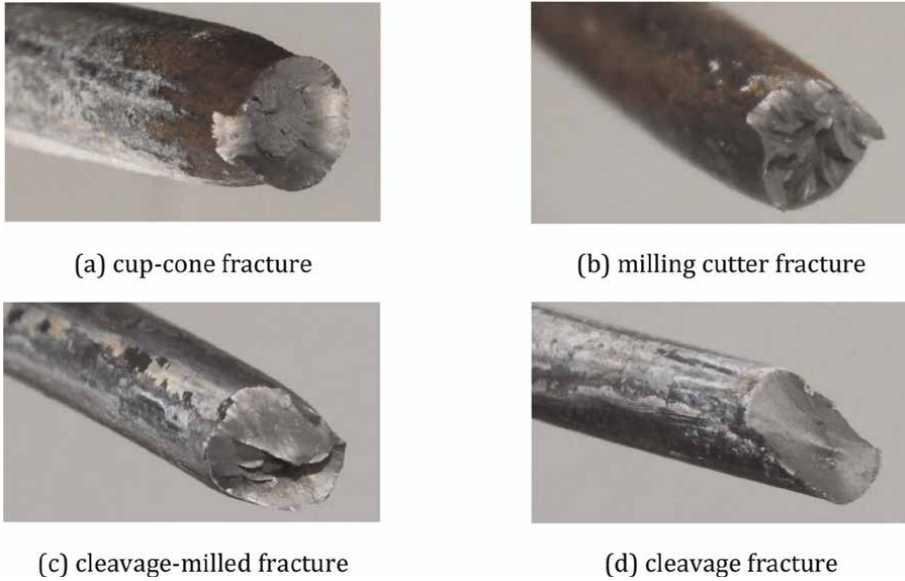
Fracture morphology of corroded steel wire under different stress conditions [15] (a) cup-cone fracture, (b) milling cutter fracture, and (c) cleavage-milled fracture (d) cleavage fracture.
